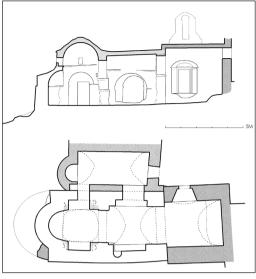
Agios Demetrios at Chalandra. Plan and longitudinal section.
